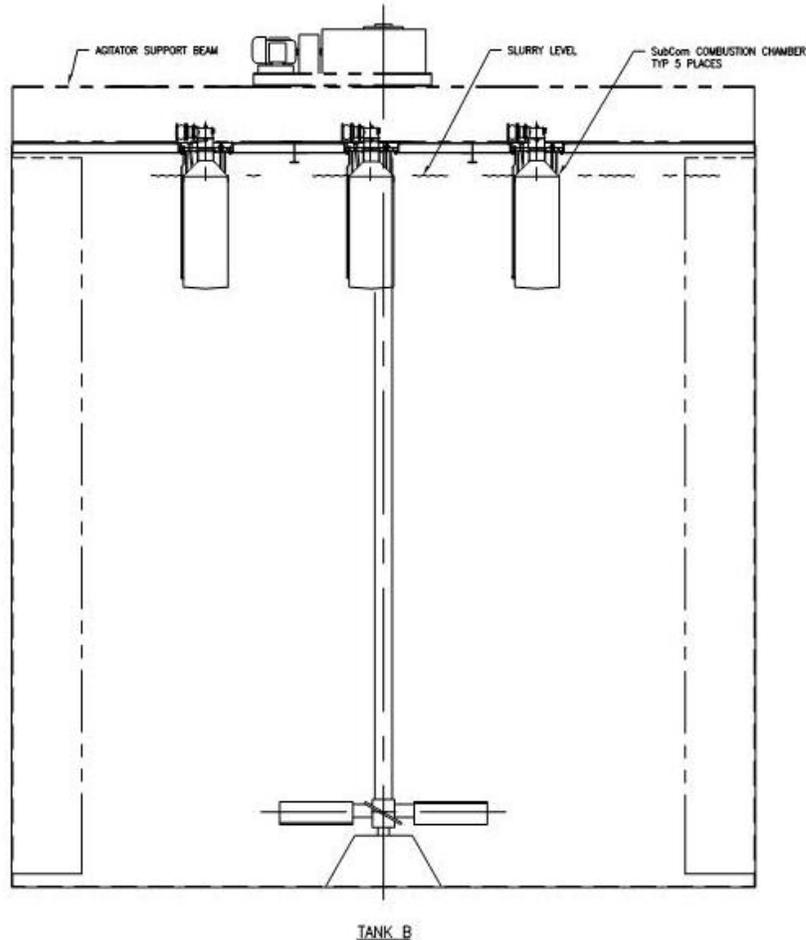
Slurry Storage Tank Heater Elevation Layout
